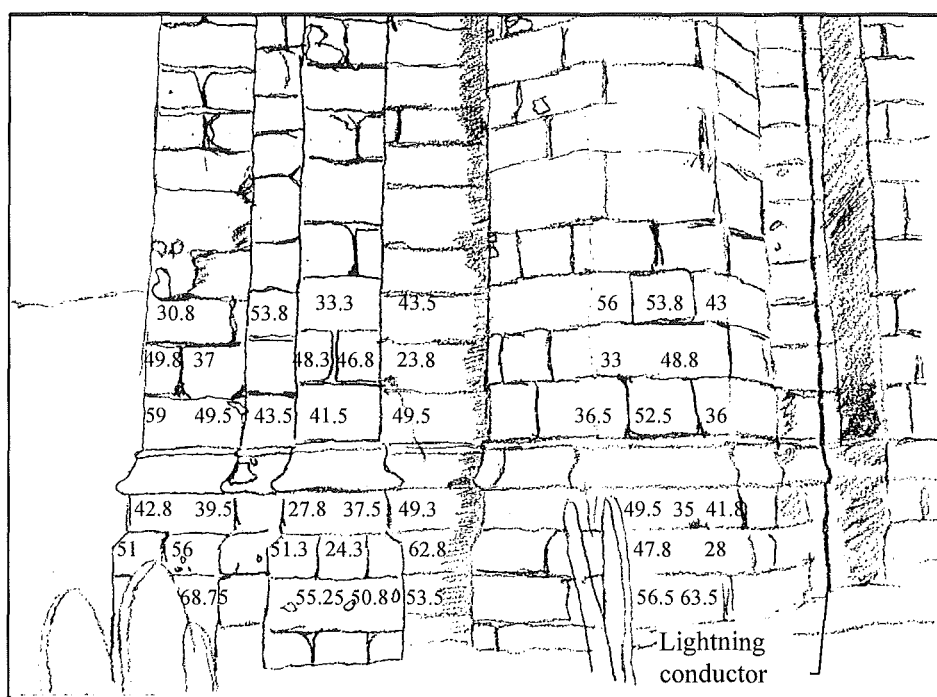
Sketch plan of Shaugh Prior, south facing wall.
